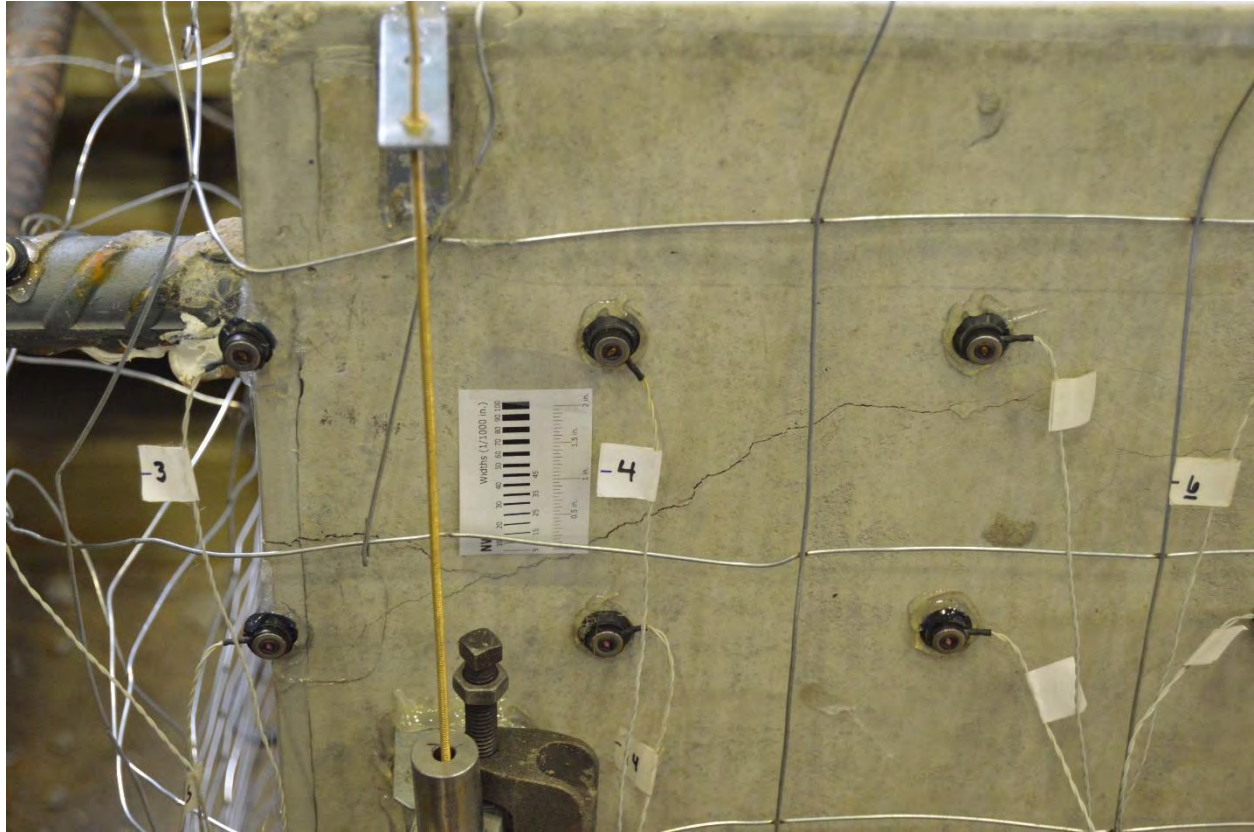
Test Photo Specimen D11, NW corner, 110 kips
